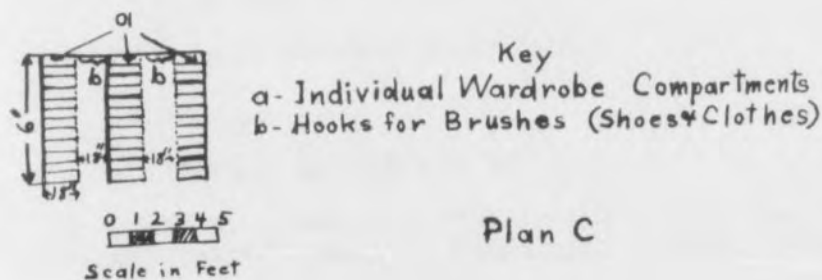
WALL CABINETS OPPOSITE WINDOWS
